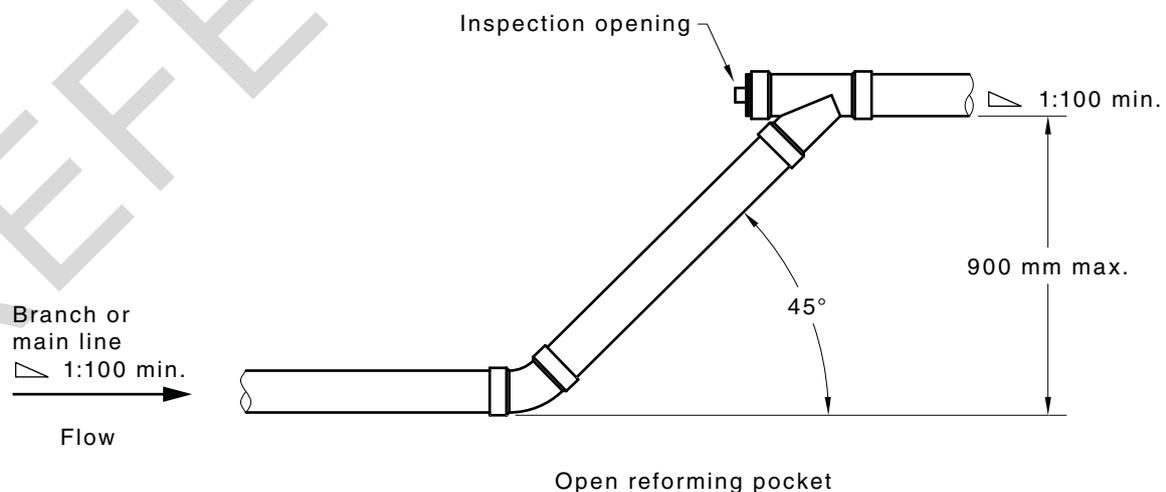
TYPICAL OPEN TYPE VACUUM REFORMING POCKET
